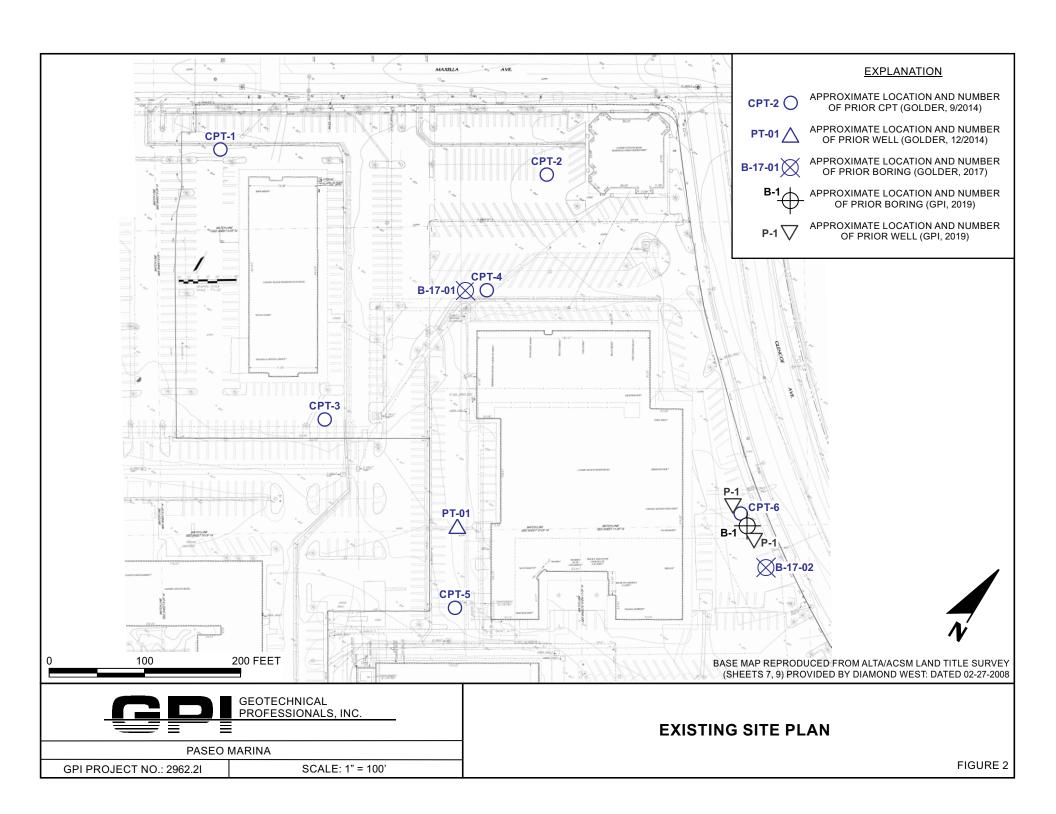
Site Location Map Figure 2 - Existing Site Plan Figure 3 - Proposed Site Plan Figure 4 - Building Sections
